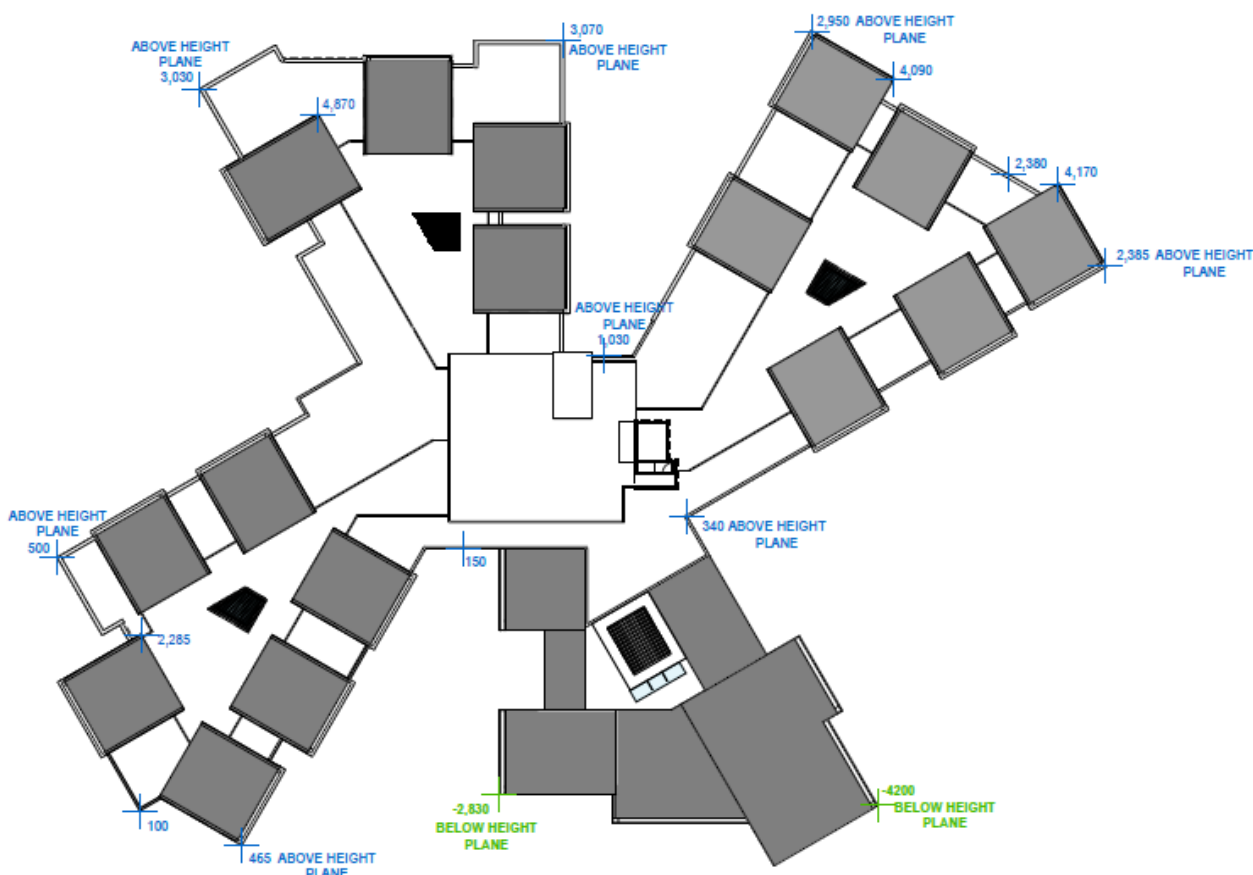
Figure 25 - Building heights above and below the 11m building height guide
